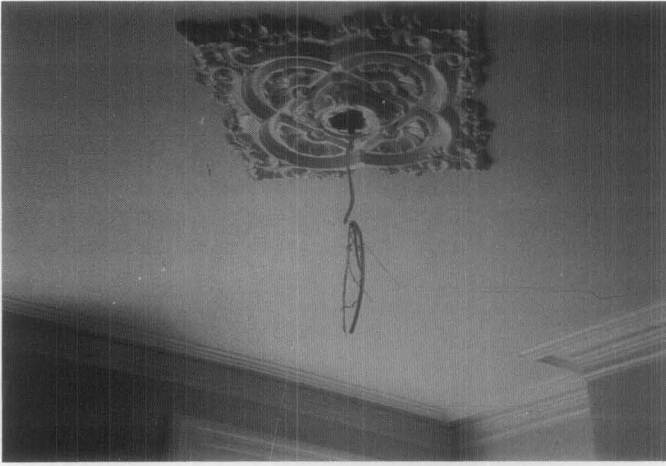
Deteriorated ceiling plaster was removed and a new drywall ceiling installed. The historic ceiling medallion was preserved, and the plaster cornices repaired in place. Photo: Landmarks Design Associates.
